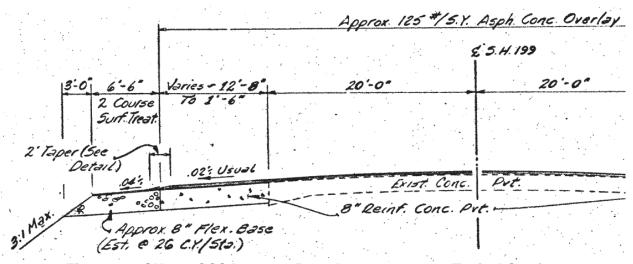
SH 199 CCSJ - 0171-05-033 Improvements – Typical Section Source: TxDOT, 1969
